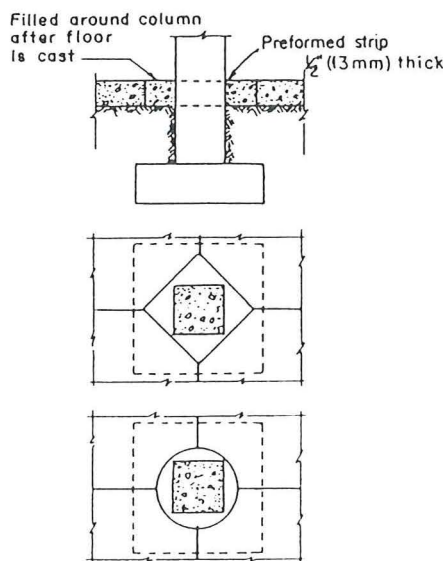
Shape of joint around features penetrating the floor slab. From ACI Committee 302.¹⁸
